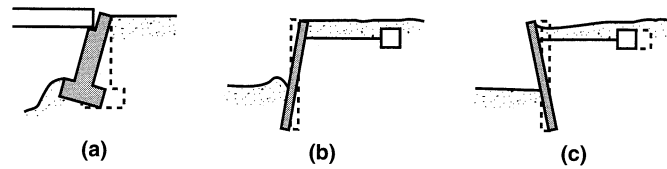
Potential modes of failure for braced walls: (a) rotation of bridge abutment about top; (b) rotation of anchored bulkhead due to lack of passive resistance (“kick-out”) at the toe; (c) lack of adequate anchor capacity.
